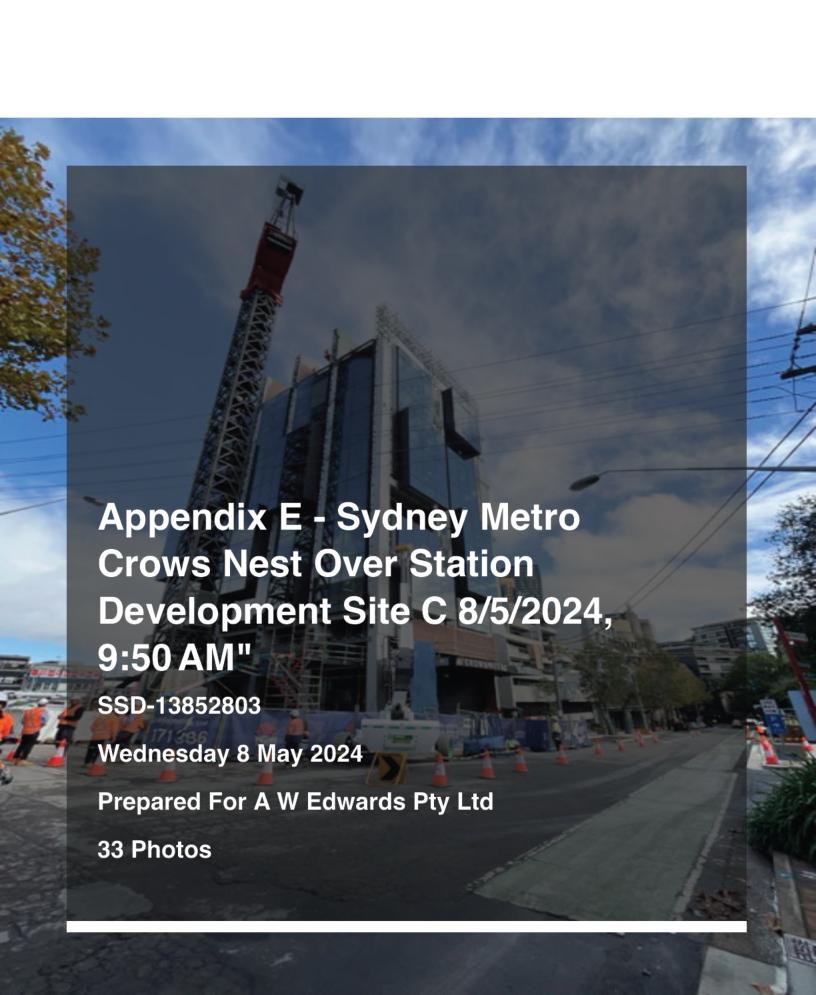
OSD Site C - Building Construction nearing completion. Traffic controls in place Site fence and hoarding in place
